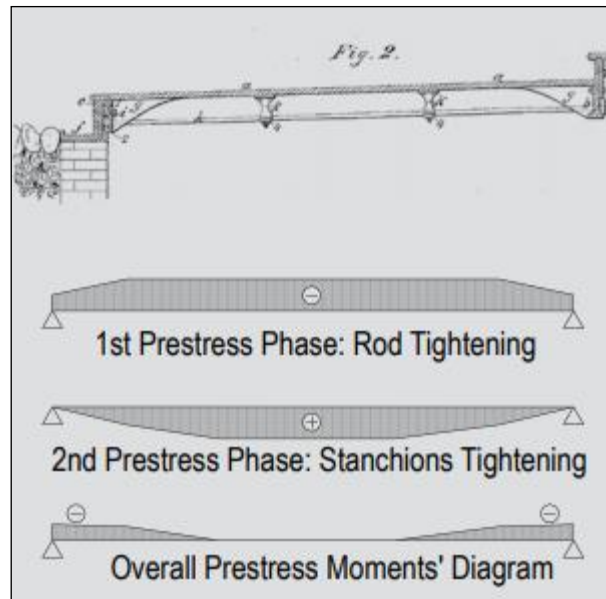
Prestress cast iron sidewalk as designed by Peter H. Jackson-Diagrams[12]
